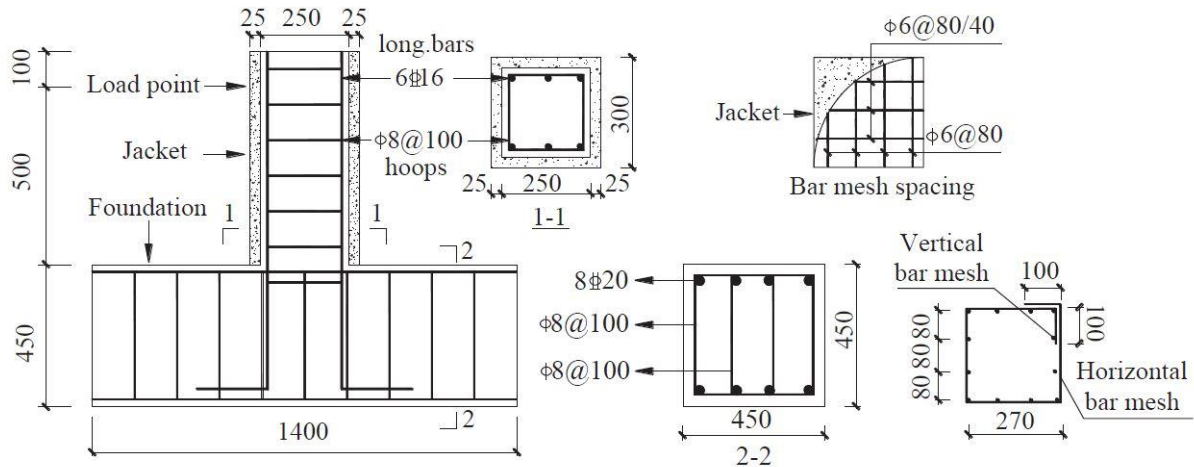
Dimensions and reinforcement details for the column specimens. (Deng et al. 2018)
